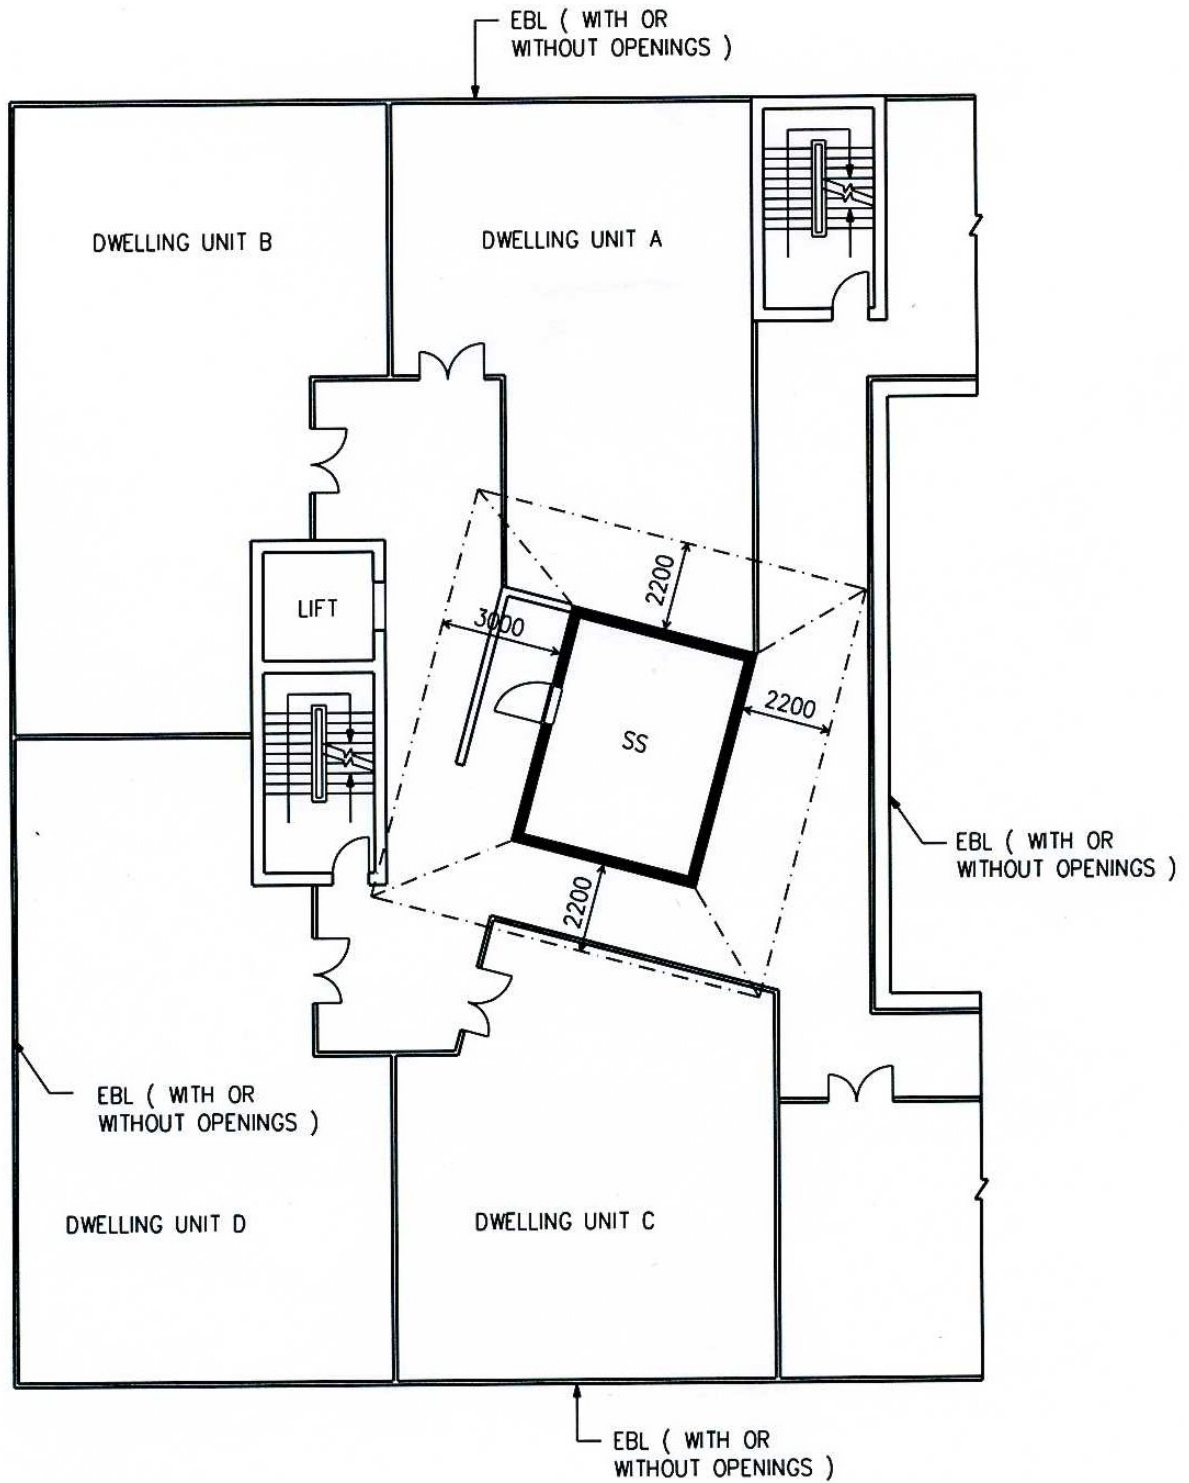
(b) REQUIREMENT ON SETBACK DISTANCE OF SS WALLS (WITHOUT DOWN-HANG BEAM) FOR STOREY HEIGHT ≤ 2800 mm
